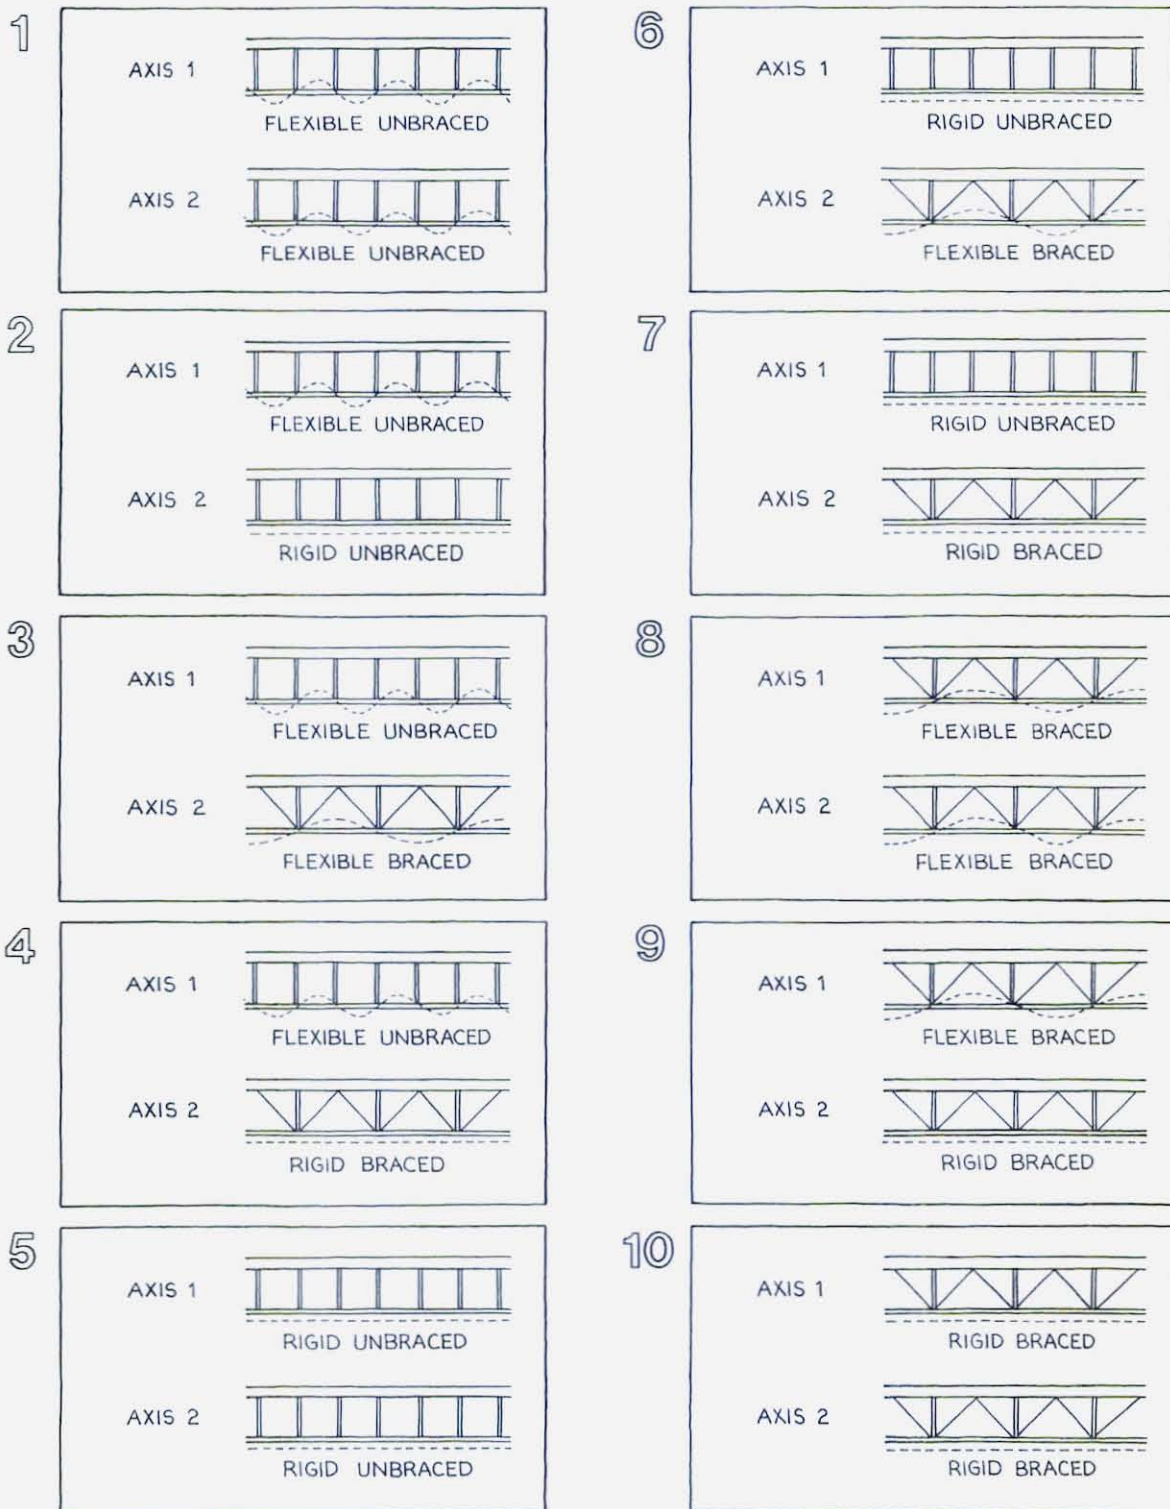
GENERIC SUSPENDED CEILING SYSTEMS. SYSTEMS ARE REPRESENTED BY CEILING TYPE IN EACH AXIS.
